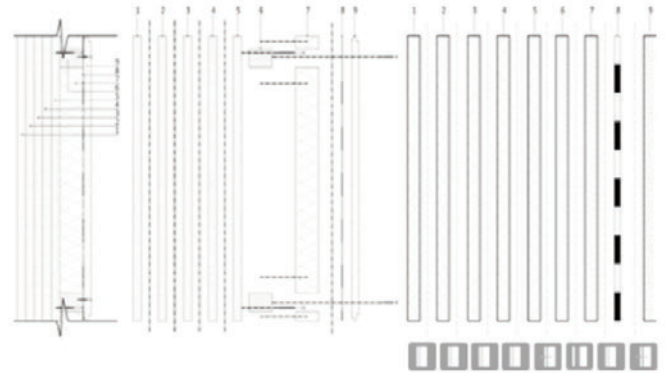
| Systems and types of connections between modular components of the building system (source: Bazzana, 2009).
